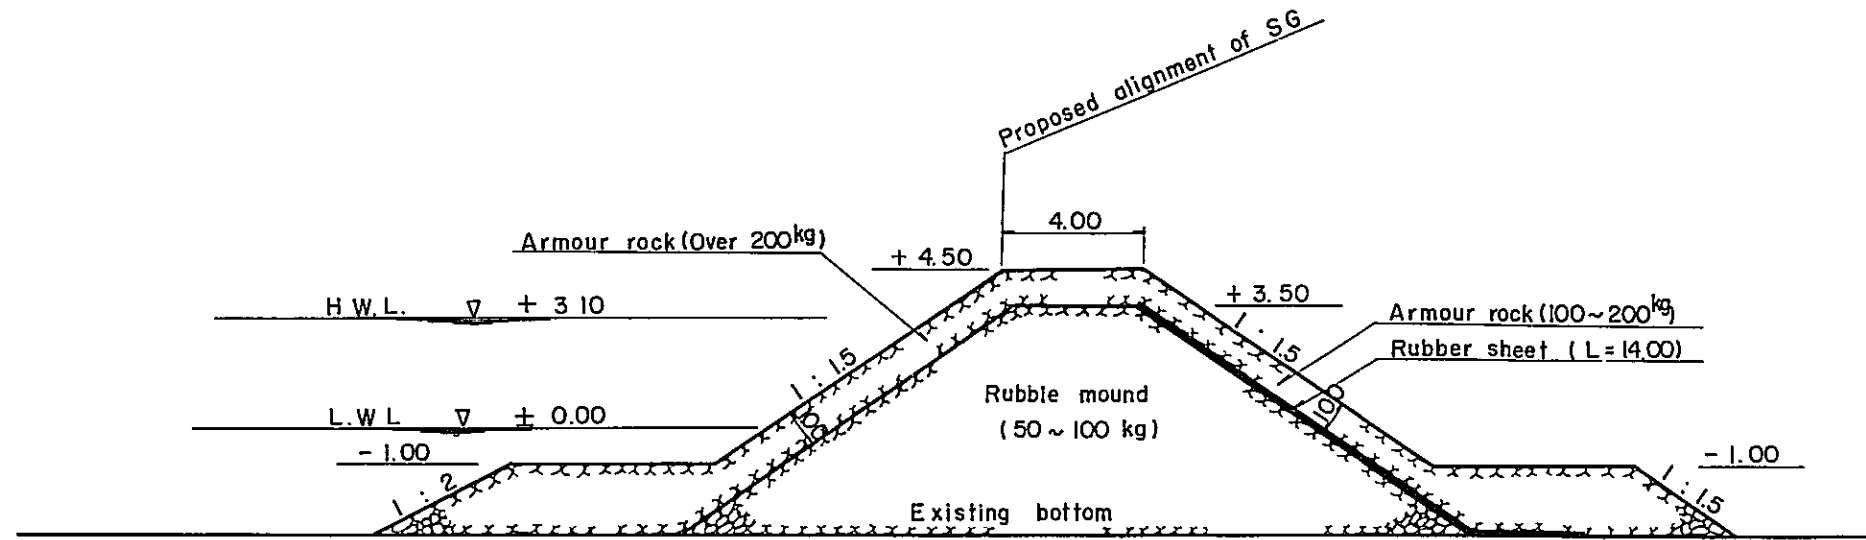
(e) STANDARD SECTION OF SOUTH SEA WALL
